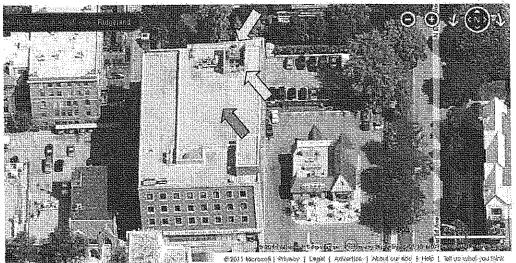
Bing.com/map overhead photograph with green arrow pointing to the approximate location of the proposed AT&T equipment and the west-facing antennas. The yellow arrows point to the two additional proposed antenna locations on the external portions of the existing mechanical enclosure screens.
